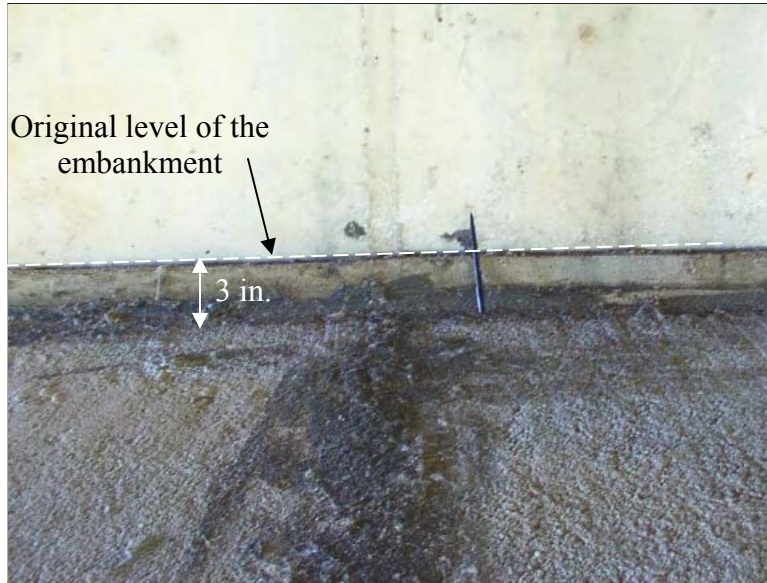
Settlement of the embankment under the bridge (North end of NBL)
